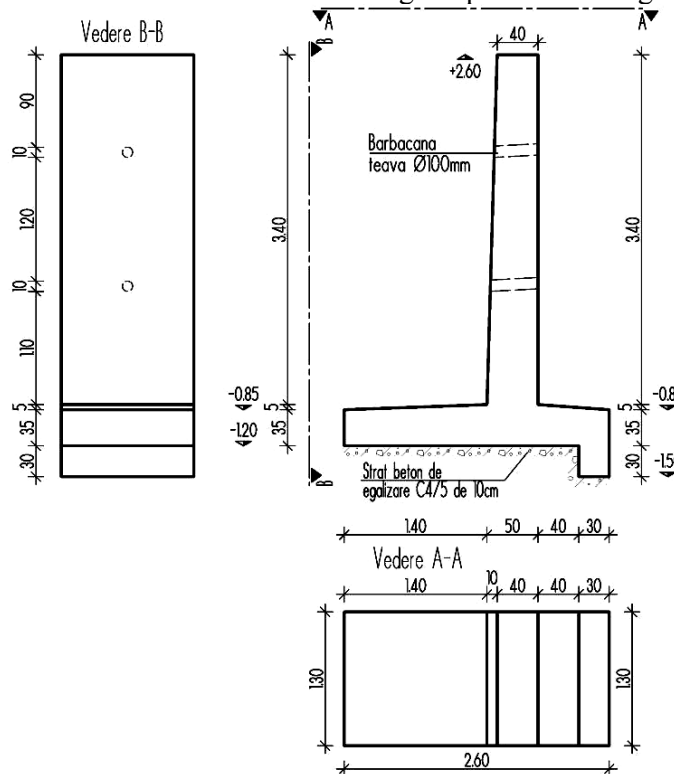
Formwork plan for a 1.30 m section length of new designed retaining wall
